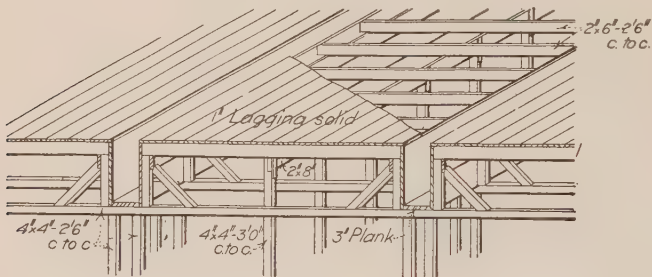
DETAIL OF CENTERING FOR LONG SPAN GIRDERS.
